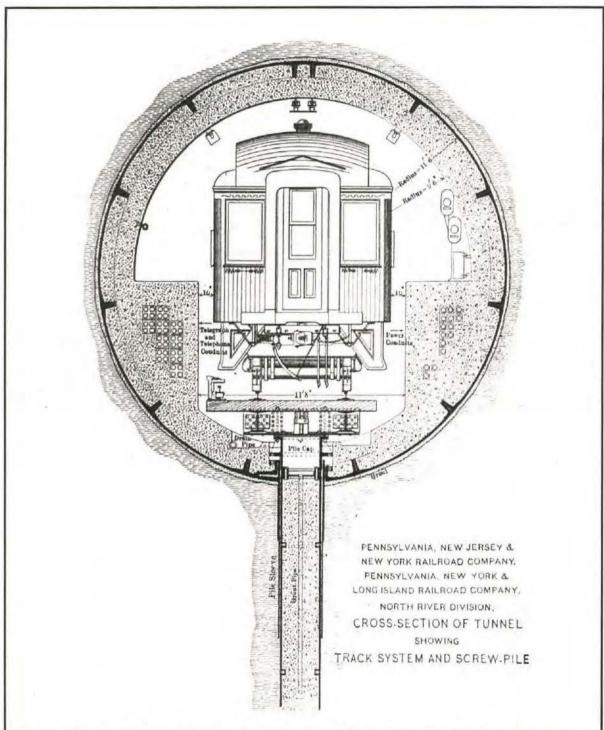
North River Division – Cross Section of Tunnel Showing Track System and Screw-Pile (New York Tunnel Extension - The Pennsylvania Railroad - Description of the Work and Facilities p. 53.)
